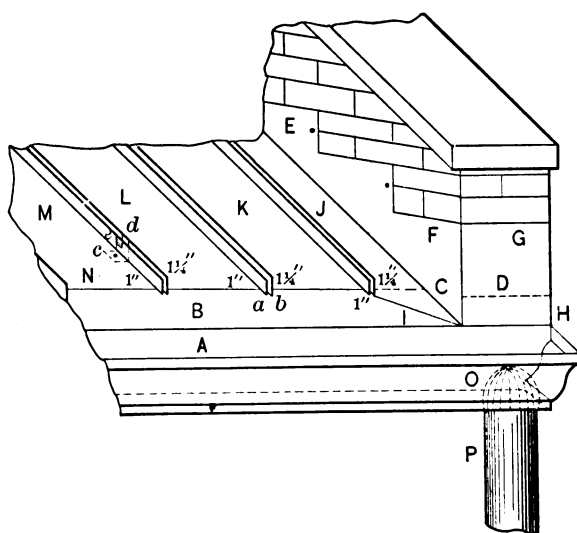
Standing Seam Roofing, Laying the Strips.
